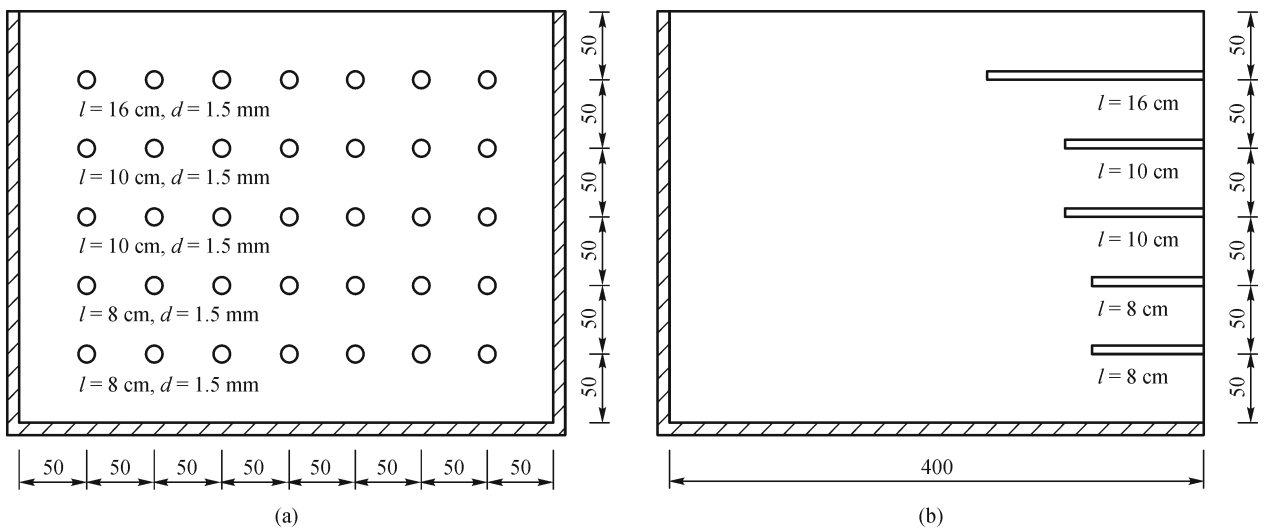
Arrangement of bolt. (a) Elevation view of bolt arrangement; (b) profile of bolt arrangement (case 4, unit: mm)
